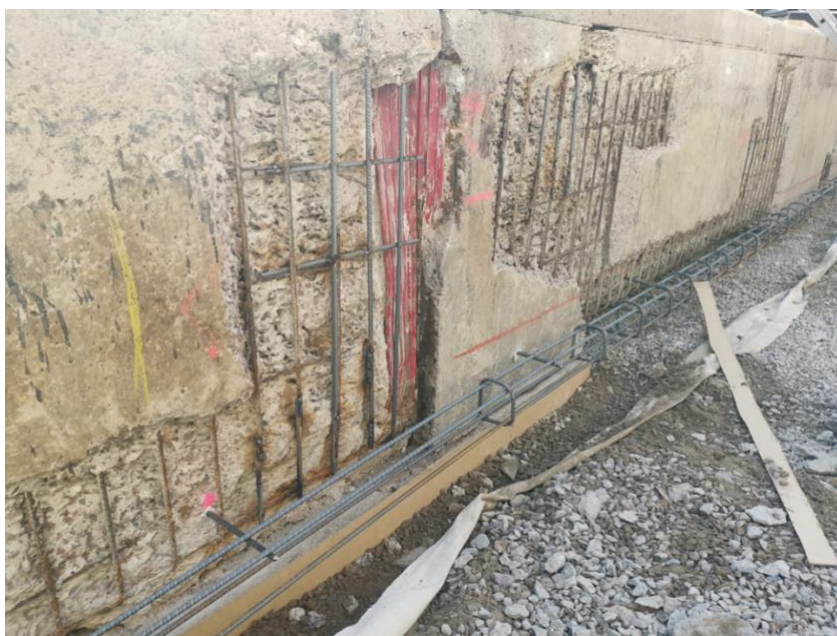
Removed loose concrete and new reinforcement for the manufacture of a weir (photo Öresundskraft).
